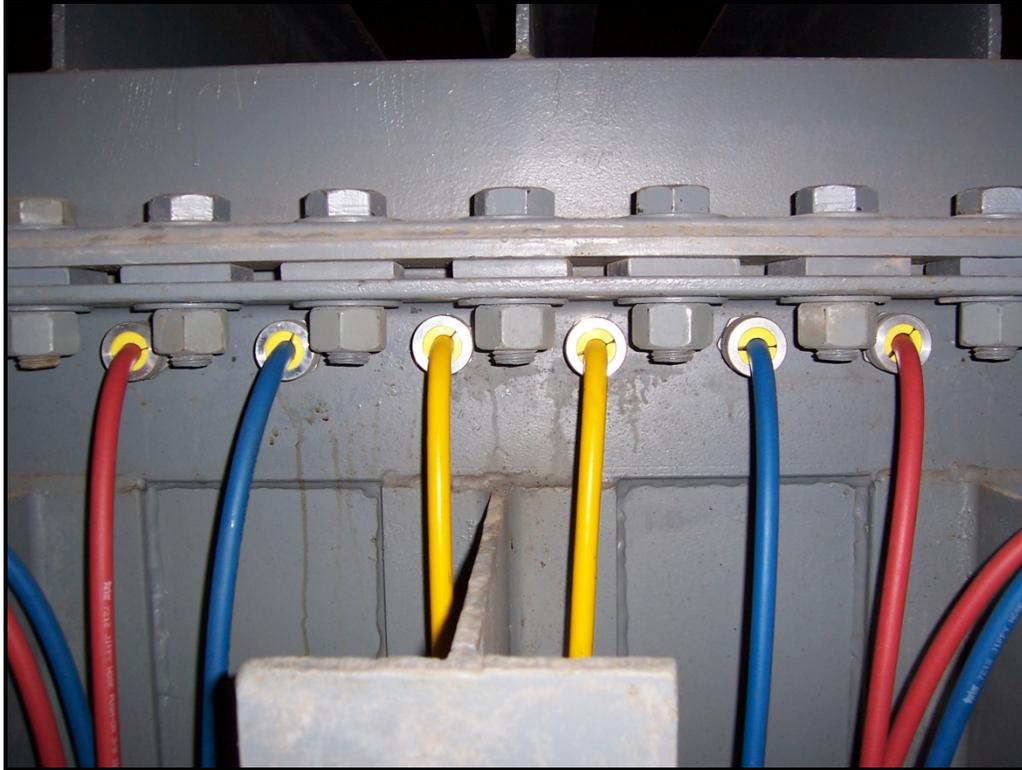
Close-up of air hoses being routed through Soil Box East wall.
